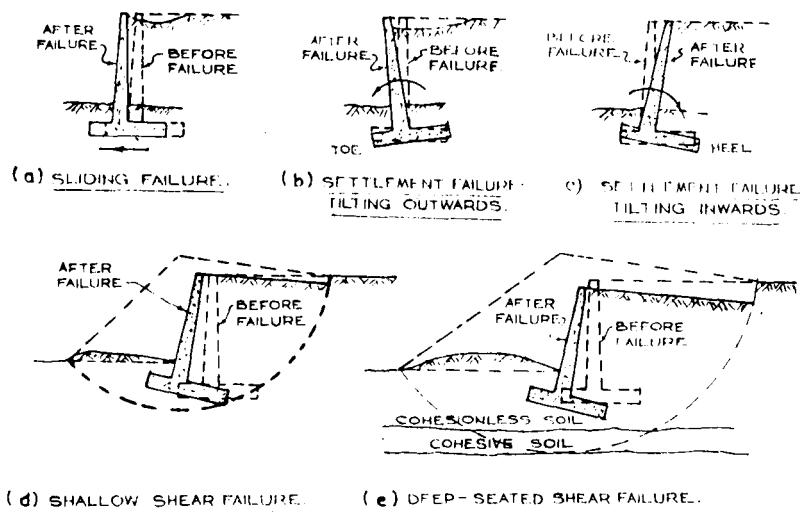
FAILURE OF WALLS DUE TO VARIOUS CAUSES (Huntington)<sup>4</sup>
